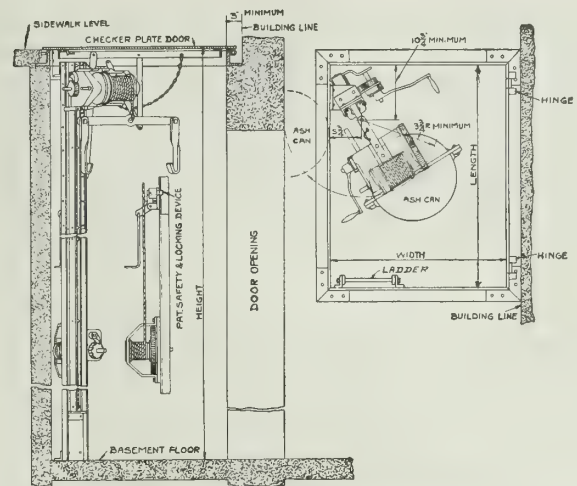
ELEVATION AND PLAN OF ERNST SIDEWALK OPERATED TELESCOPIC ASH HOIST
